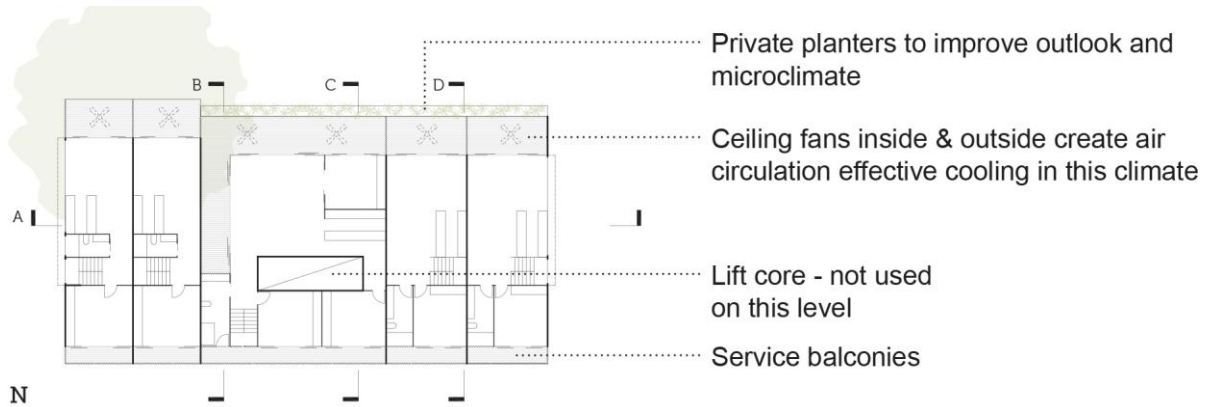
Ventilated Core Plan: dwelling levels 1, 3 & 5
